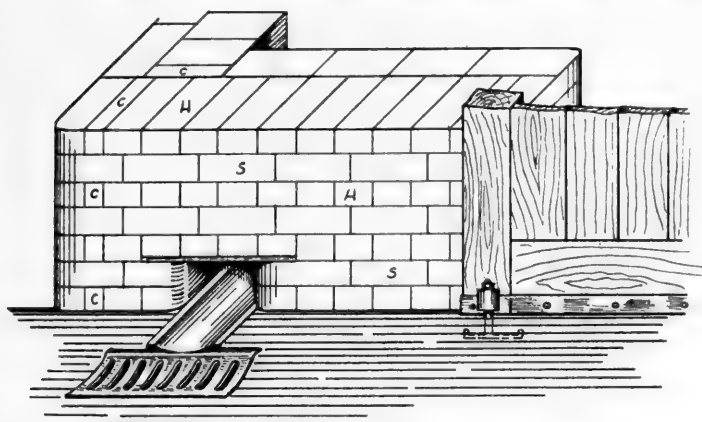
A 14 inch thick wall in English bond showing a bullnose corner, a drain outlet, a door guide and a sliding door.
